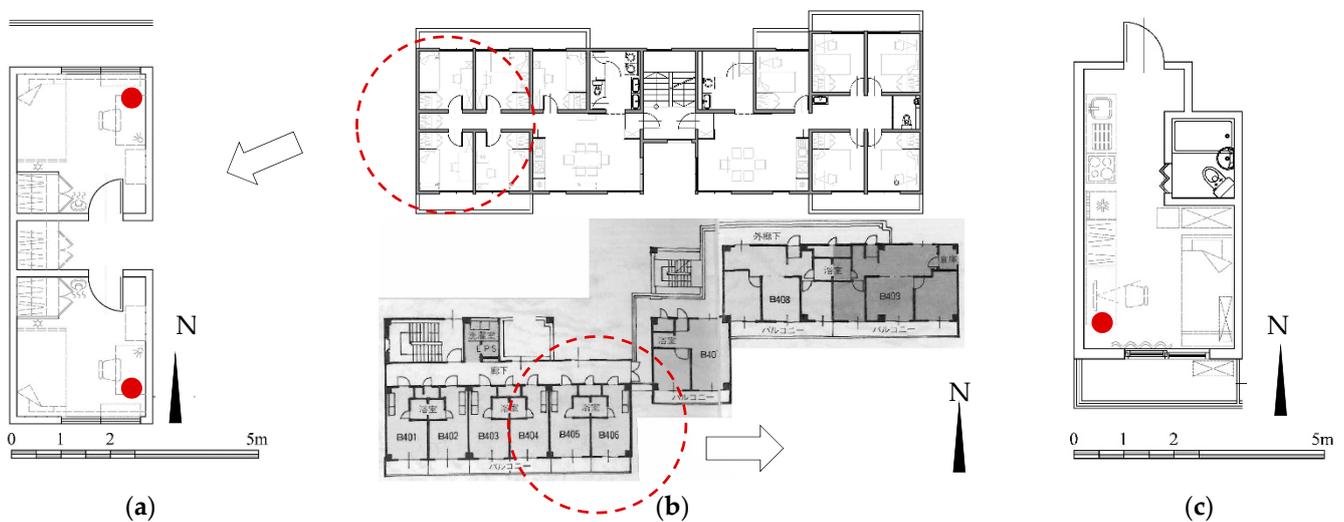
Floor plans of dormitory buildings in TUT: (a) GSD; (b) TUT campus and dormitory locations; (c) Kaikan.
